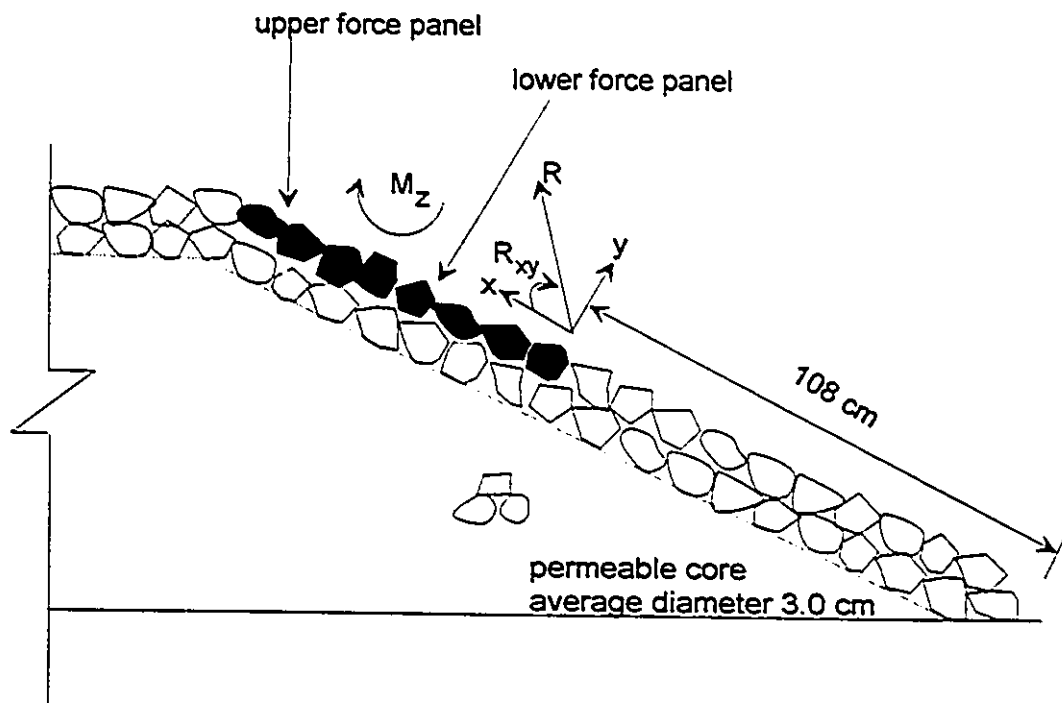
Sketch of the downstream slope armour layer and force panels
